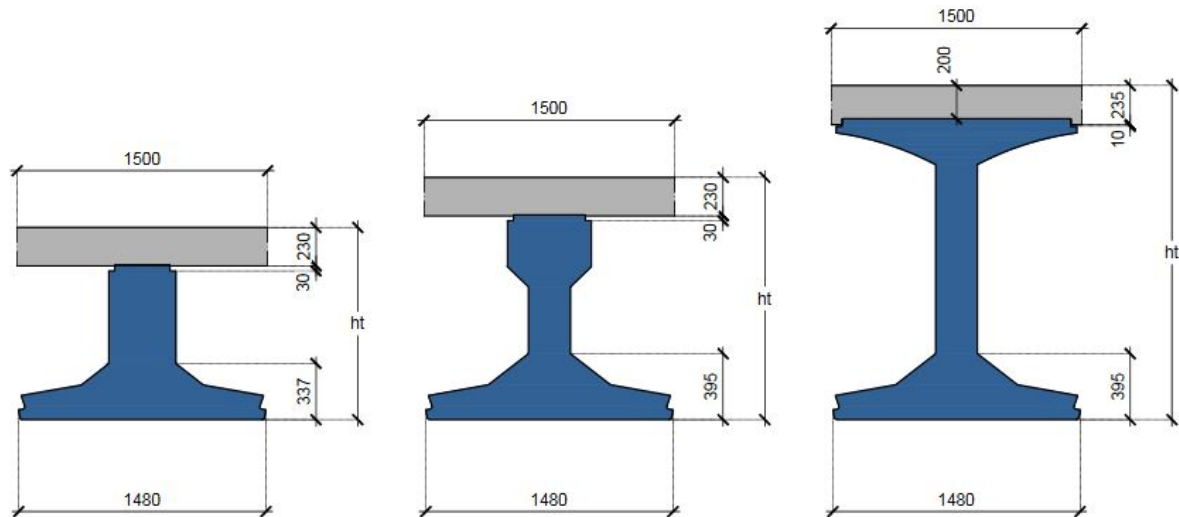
Girder bridges from inverted T-beam (left), inverted T-beam with compression zone (middle) and the I-beam (right) Source: Spanbeton
